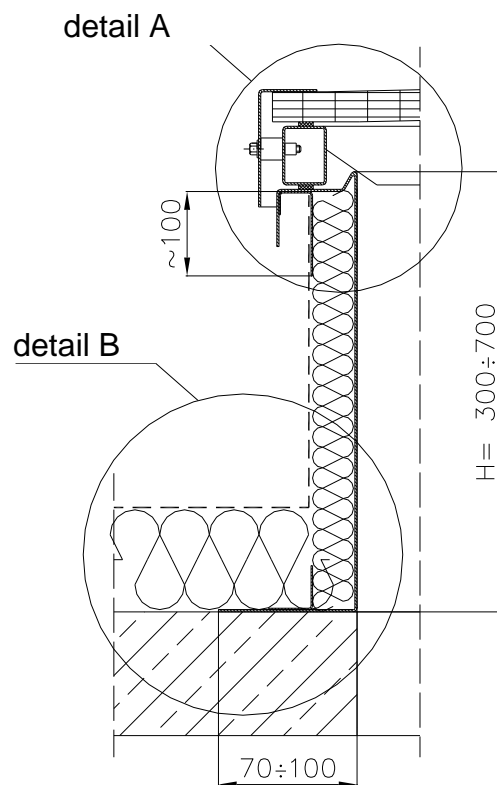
Placement of steel base on roof (DETAIL B) and method of sealing with roof membrane or roofing paper (DETAIL A)
